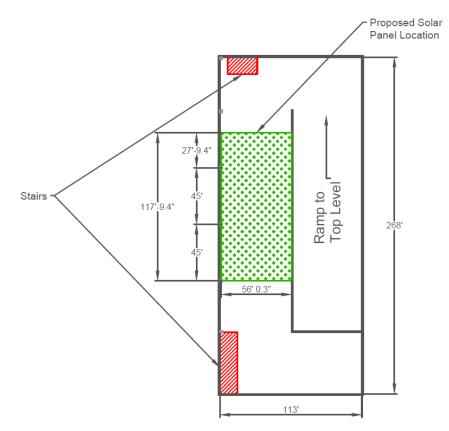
Plan View of Top Level of Gateway Parking Garage with Proposed Solar Panel Location
